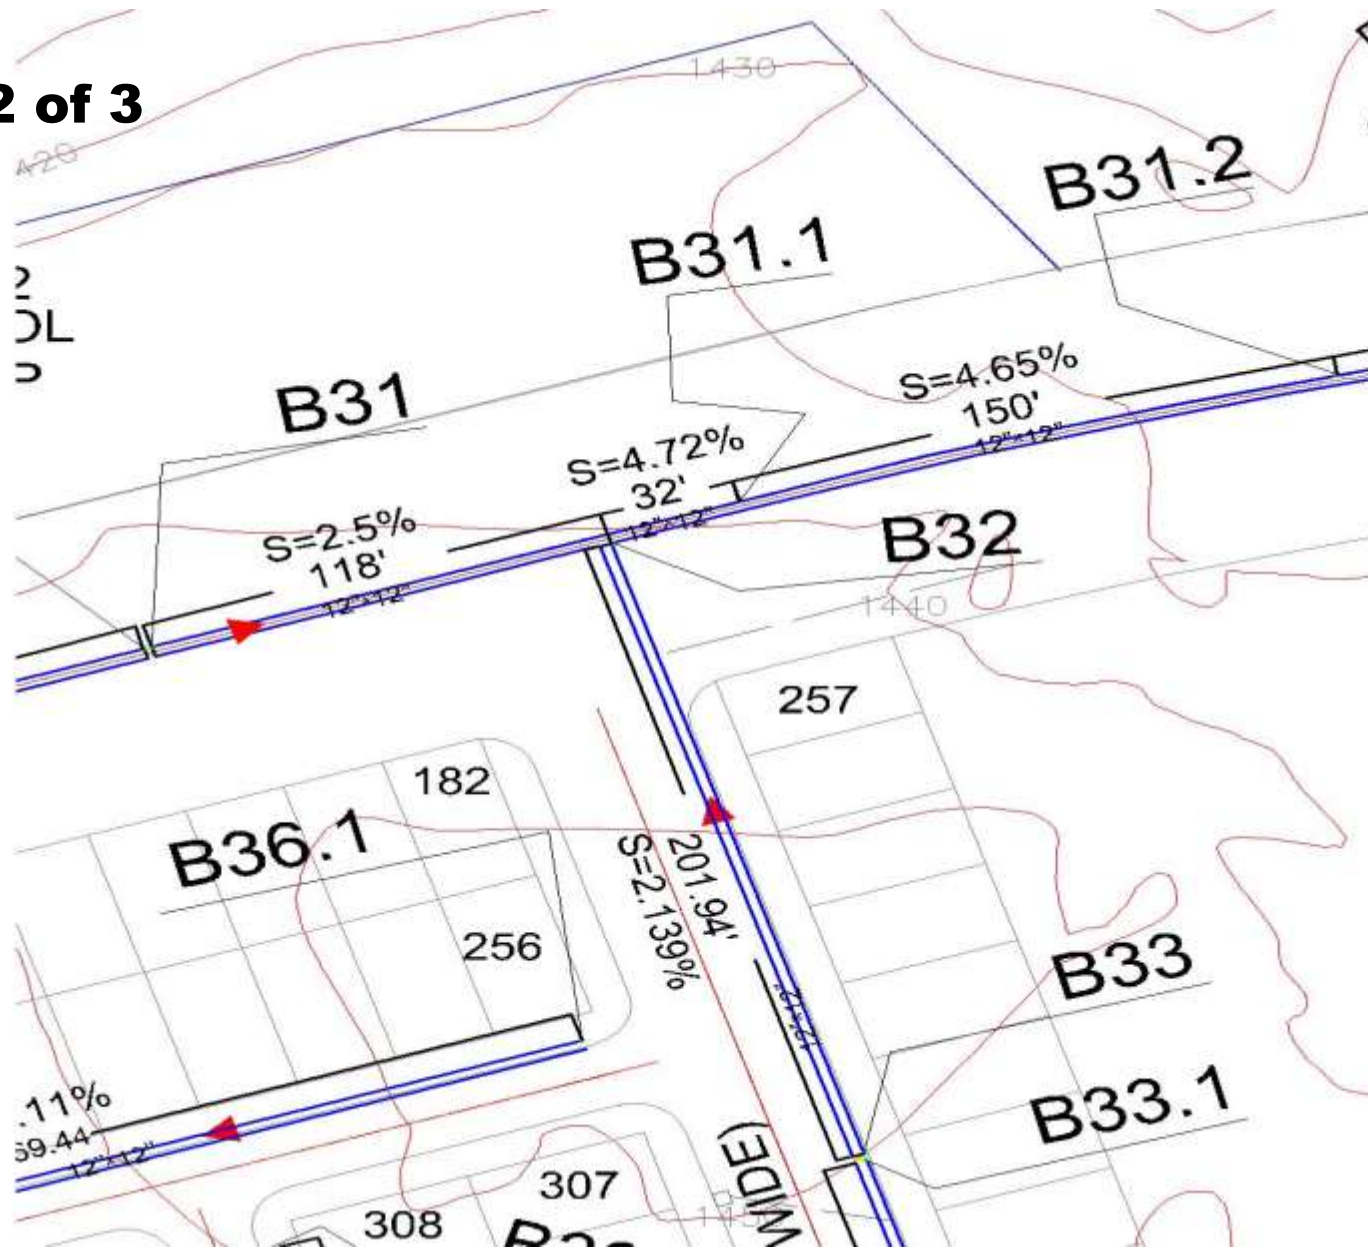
Storm drainage layout plan of Sub-catchment-3 showing initial nodes B33 & B31
